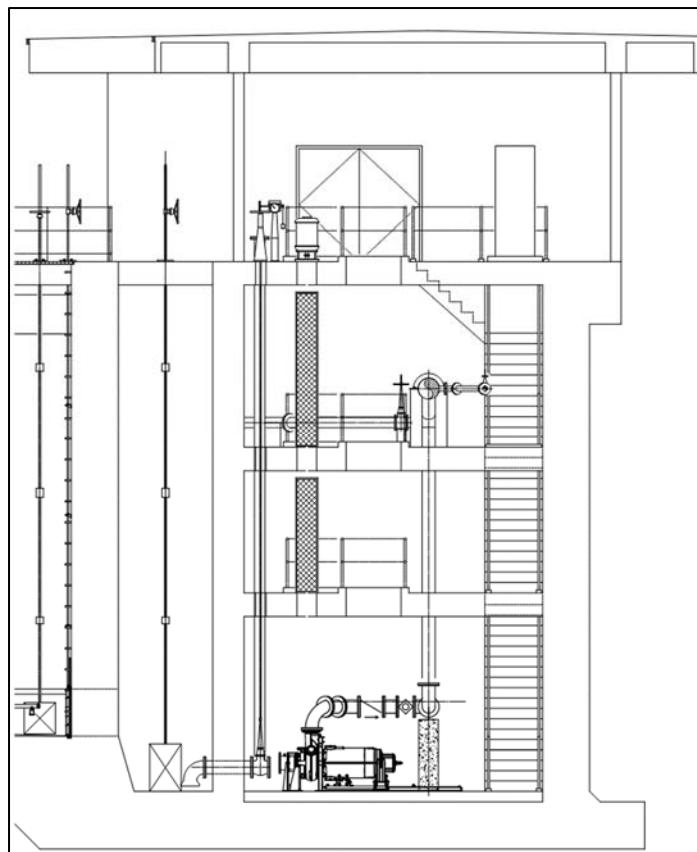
EPS with New Dry Pit Submersible Pumps - Section View
